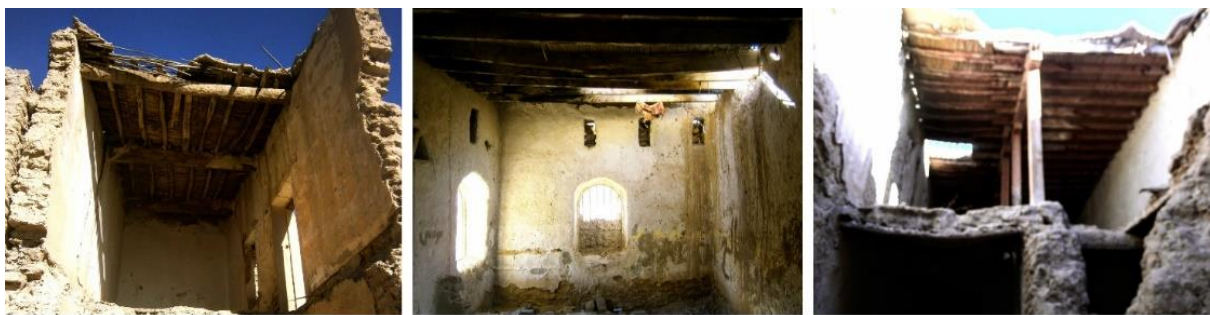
Views of the roof structures in the ksar of Chetma: palm wood post-and-beam. Photos by authors, 2024
